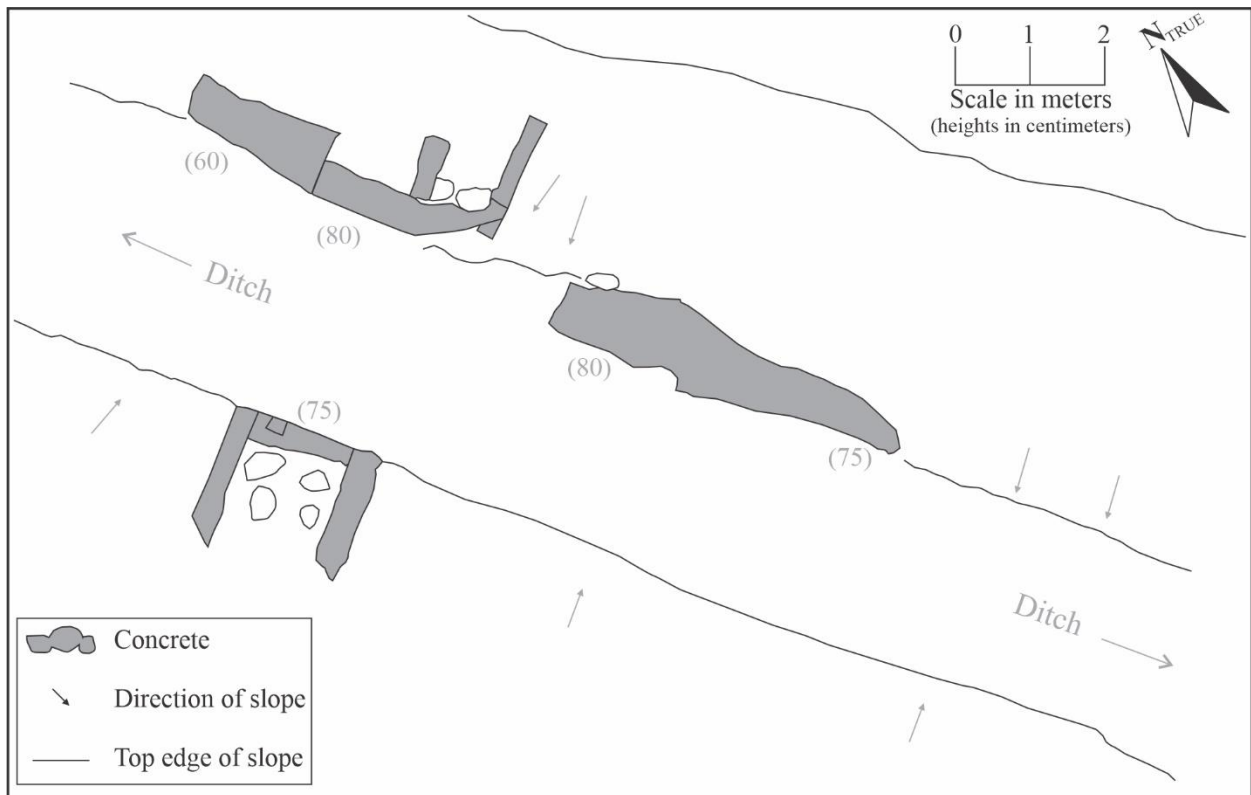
Site 31284 Feature AM ditch and concrete sluice gate plan view.
